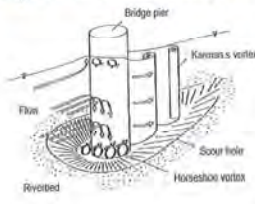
Bridge settlement damage due to bridge pier scouring (Japan Example)
